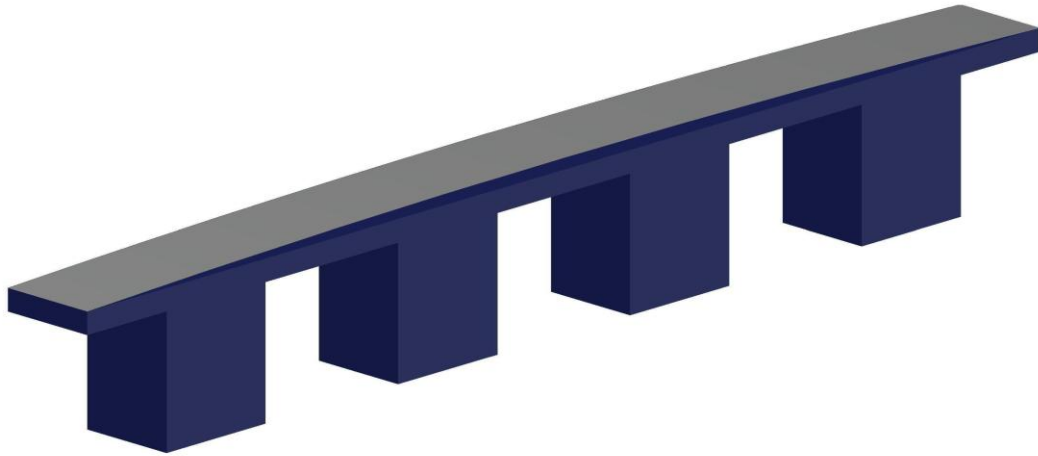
3D Model of First Concept 4 Girders Bridge System
